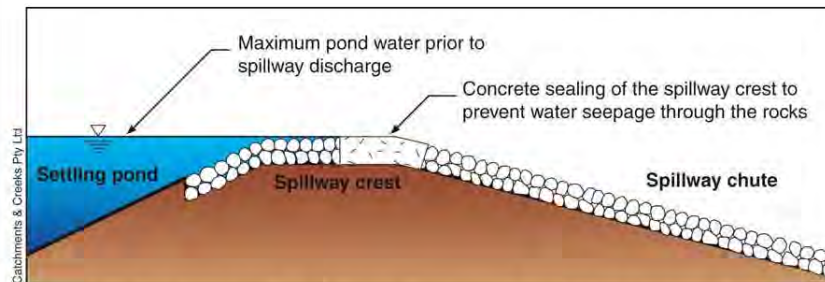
Concrete sealing of the spillway crest to control seepage through the rock lining
